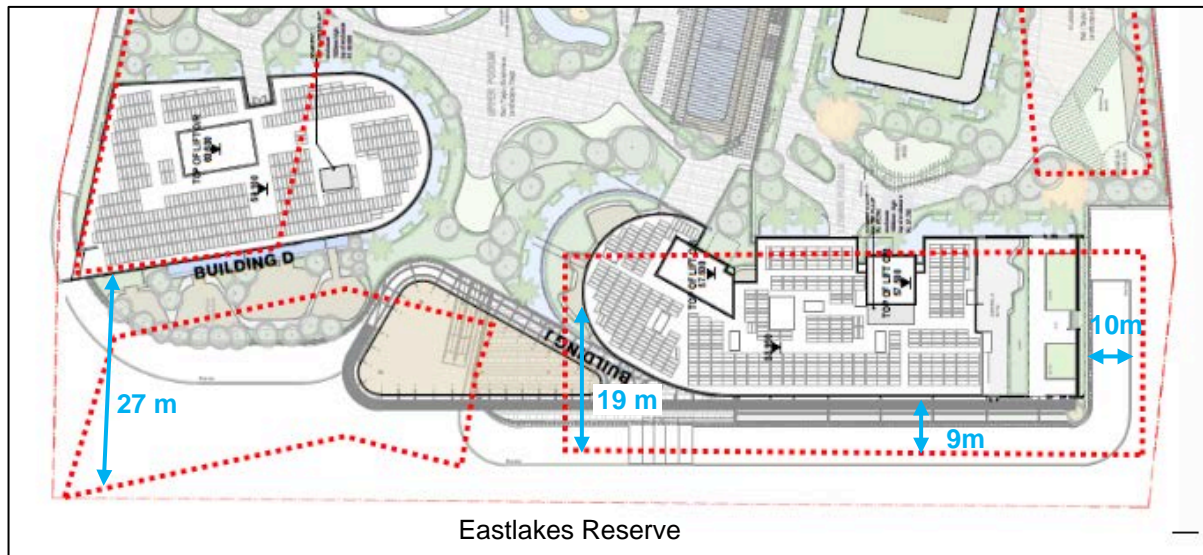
| Site plan of proposed development showing approved residential building envelopes in red (Base image source: Proponent's SRtS)
